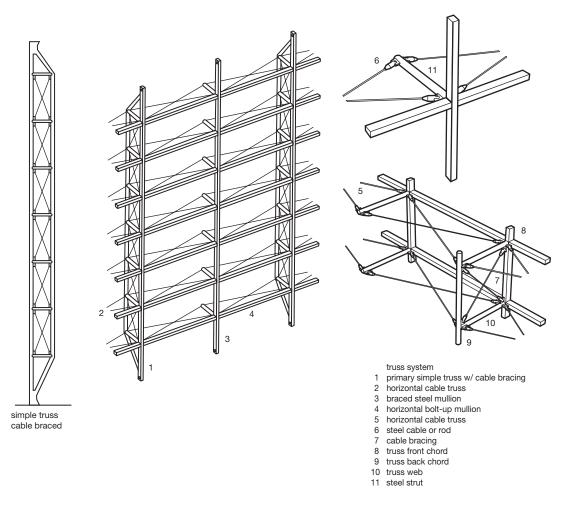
Truss system diagram with a vertical simple truss and a horizontal cable truss.
